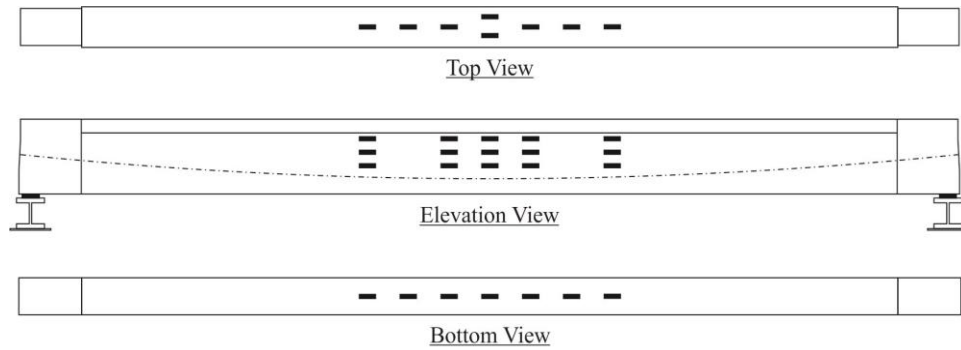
Location of 60-mm foil strain gages: SS precast specimens
